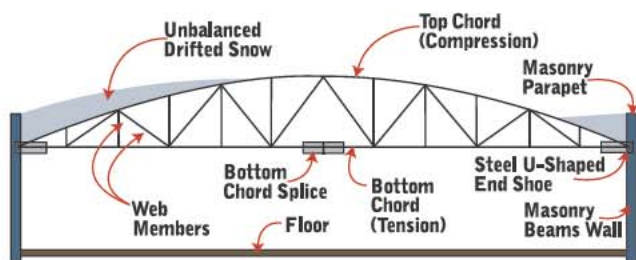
Components of a heavy-timber bowstring roof truss.
